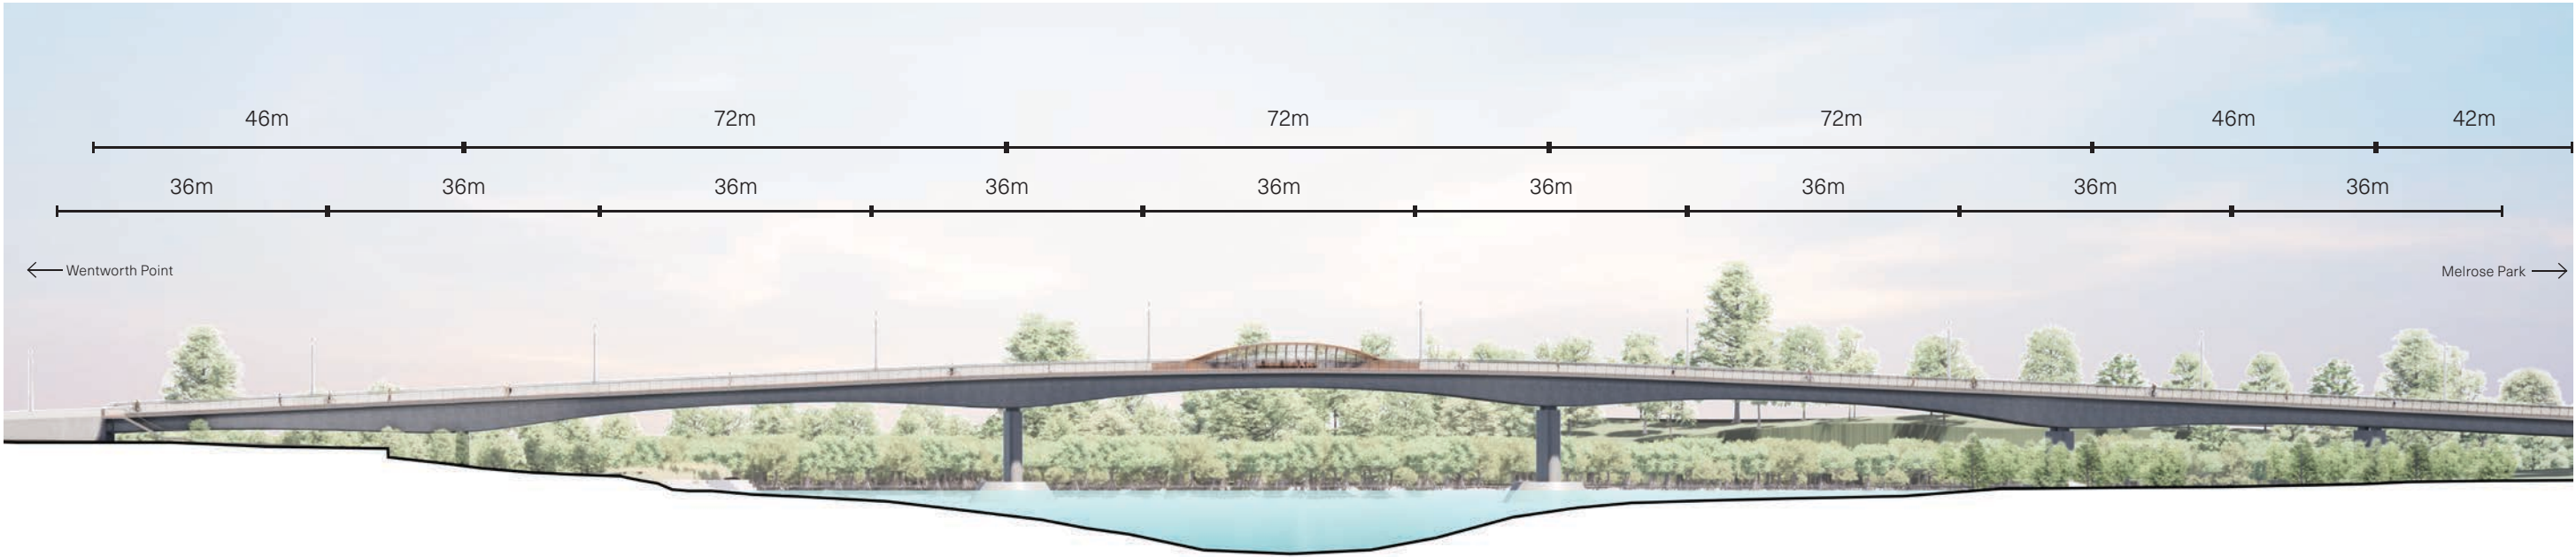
East elevation - New bridge between Melrose Park and Wentworth Point (indicative only - subject to design development).
